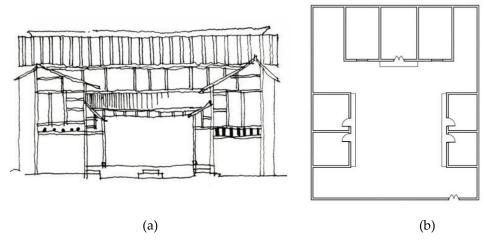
(a) Residential elevation; (b) Plan of the "U" shape.
